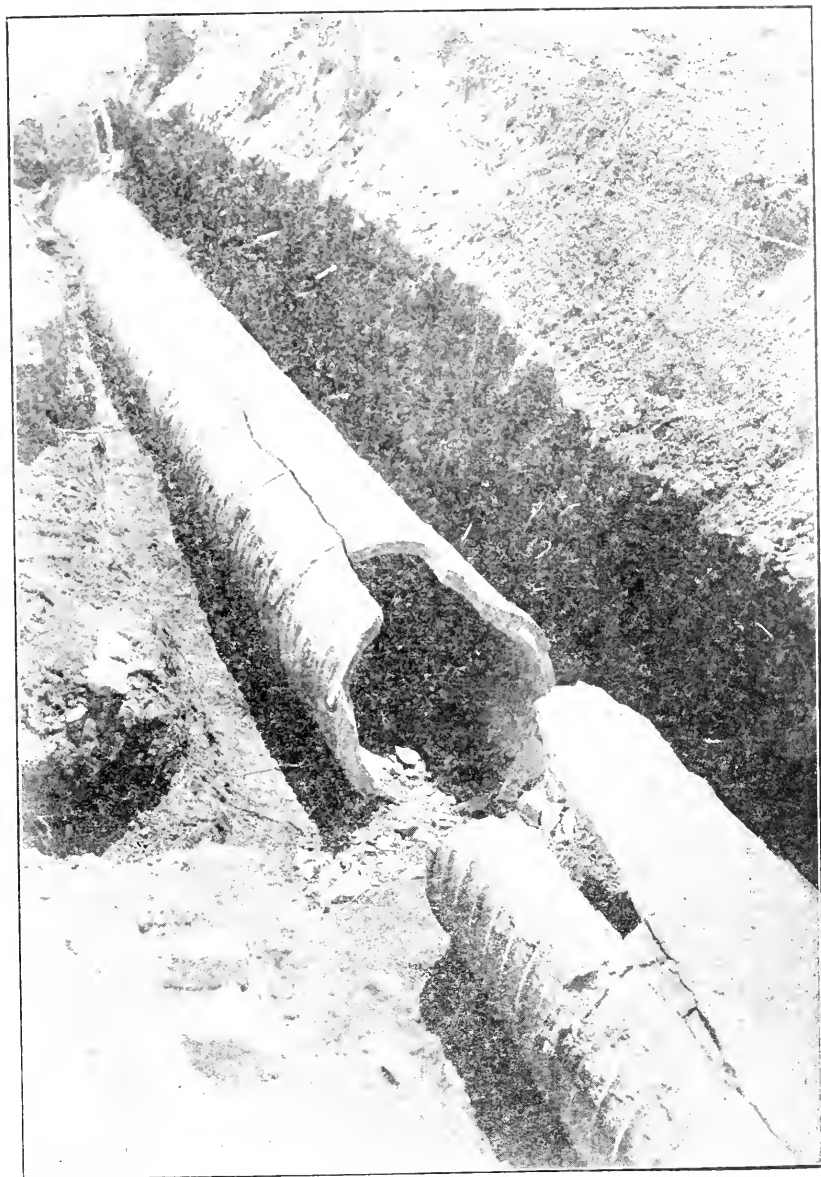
Longitudinal crack in 20-inch pipe line. The open section has been broken out with hammer. Photo by W. C. Axet'ou.
